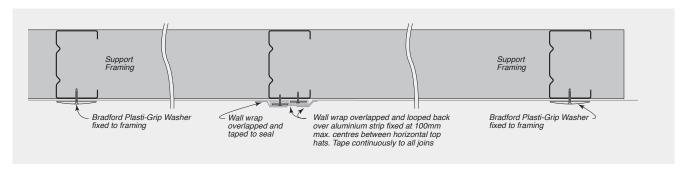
Vertical Wall Wrap Junction - Overlapped Single Strip Join
